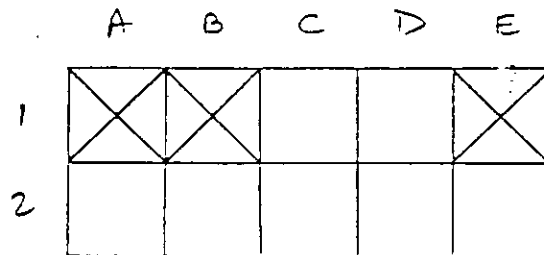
Survey Grid Locations, Building 8 Office Area --
